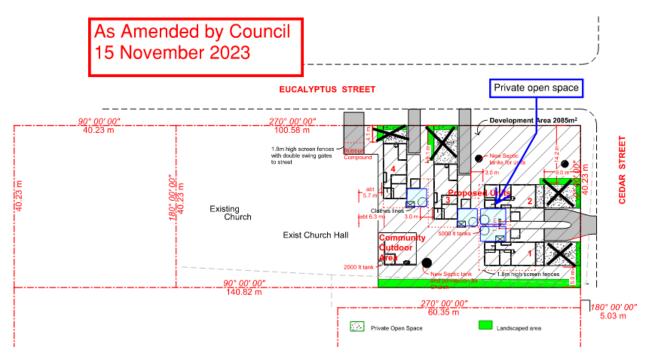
Proposed Auxiliary Site Plan (Amended by Council 15 November 2023)
